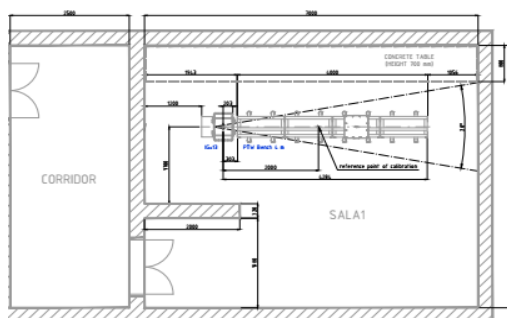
View from above of the ground floor of the selected building site for LABCAL assembly (source: authors)
